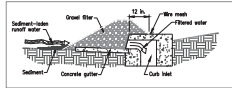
C. Cross-section detail of a gravel curb inlet protection.
